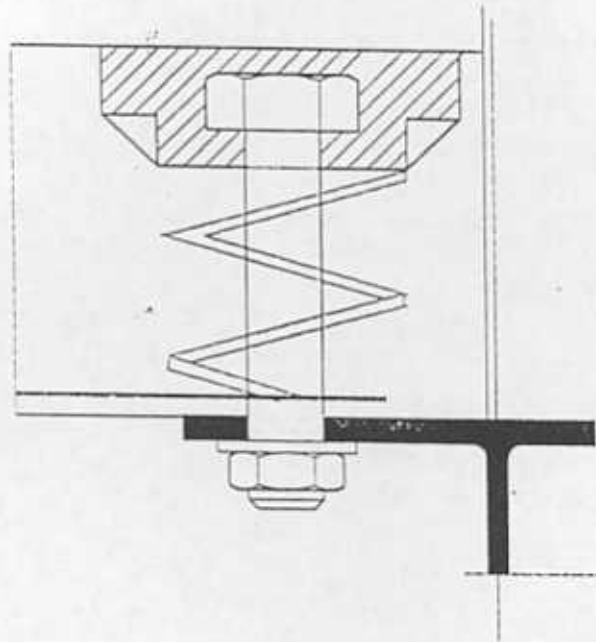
Example for Shear Connections with Friction-Grip Bolts
